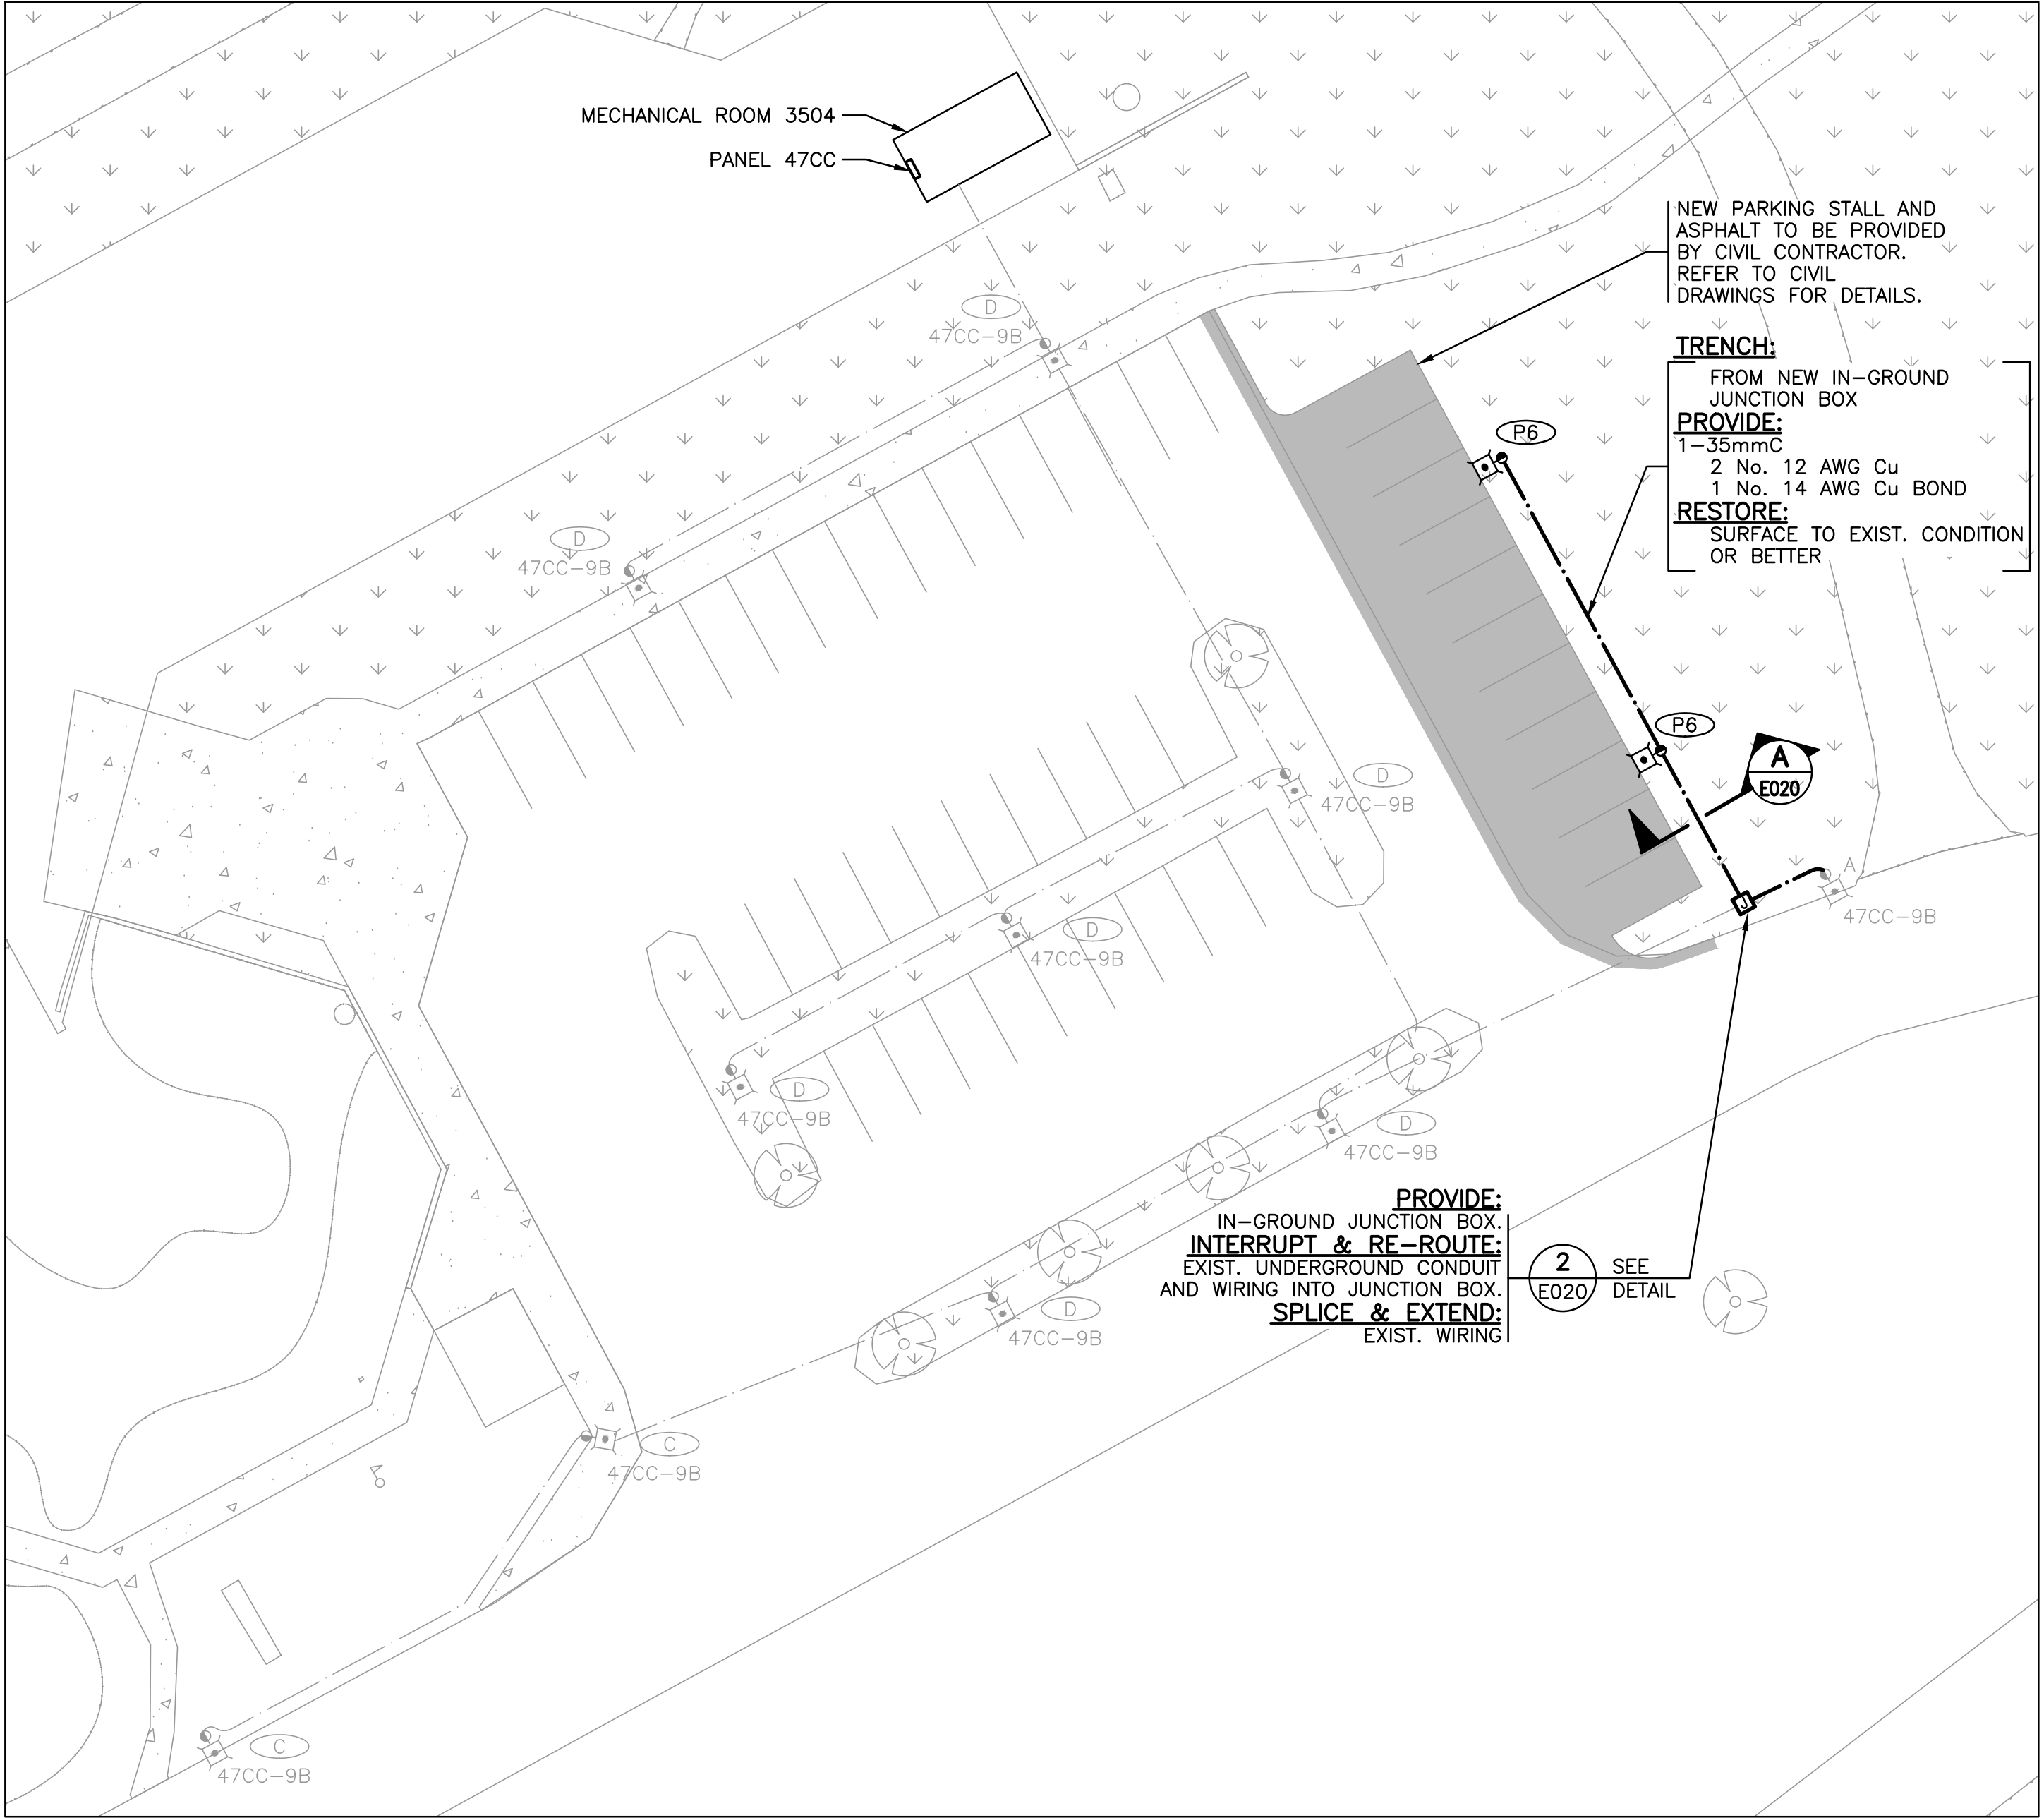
RING ROAD PARKING LOT LIGHTING – PROPOSED
